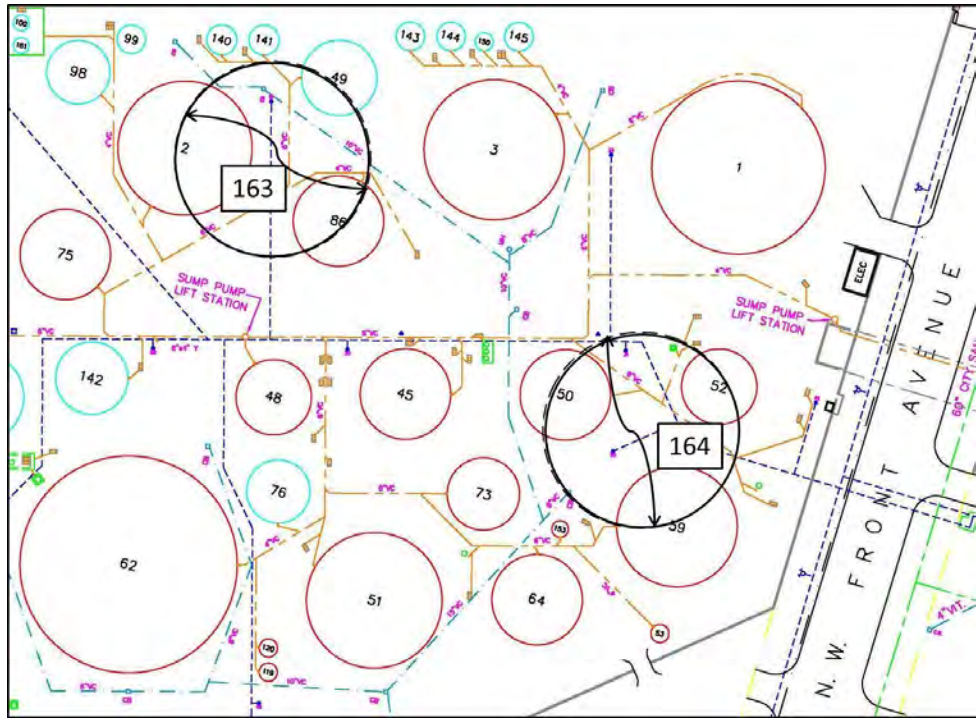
Replacement Tanks 163 and 164 at Willbridge Terminal
